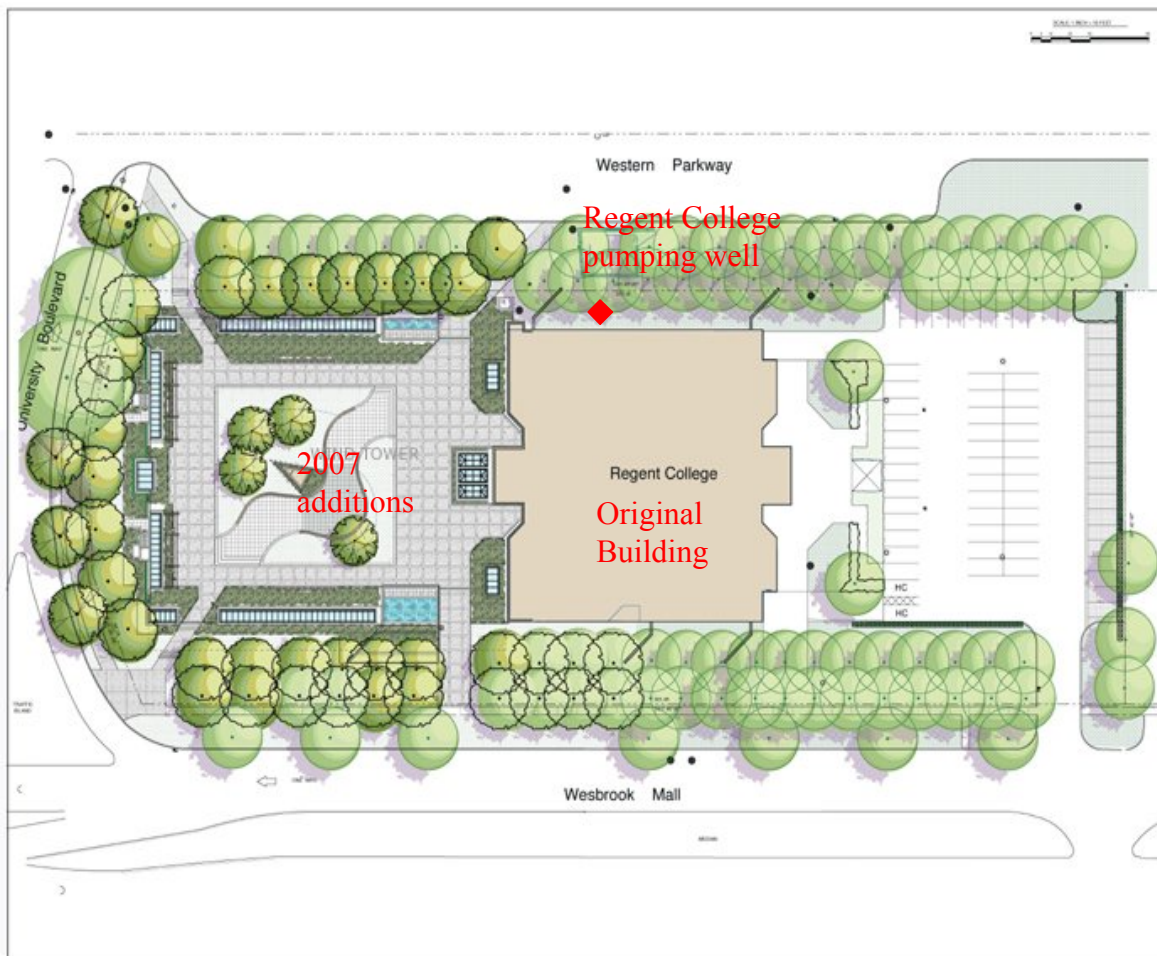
Plan of Regent College showing original and new buildings as well as pumping well.
